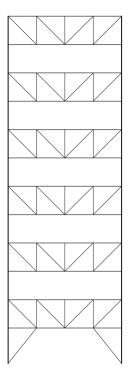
12-story staggered truss model structure without a central corridor (Type B).
